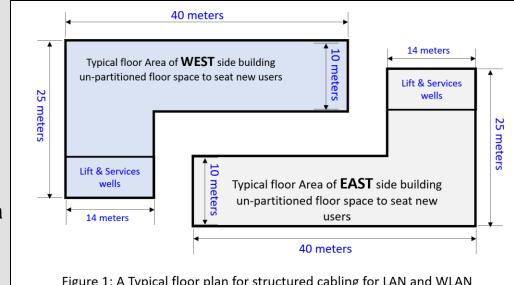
A Typical floor plan for structured cabling for LAN and WLAN (Building(East + West) is 2-storey high)
